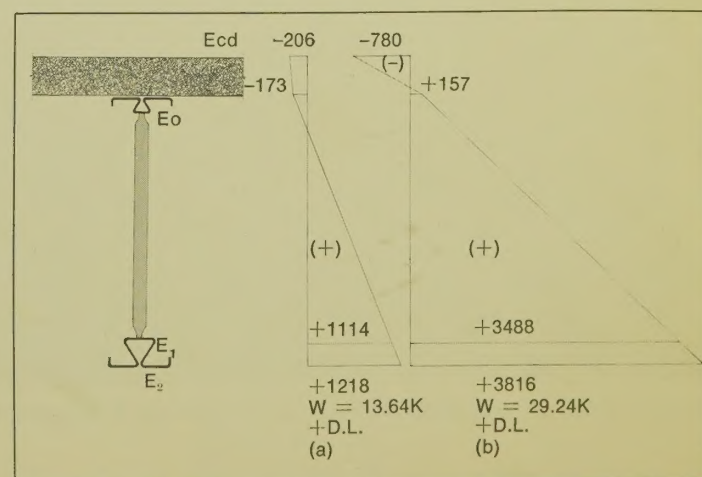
Stelco Tower joist strains (inches/inch x 10⁻⁶).
